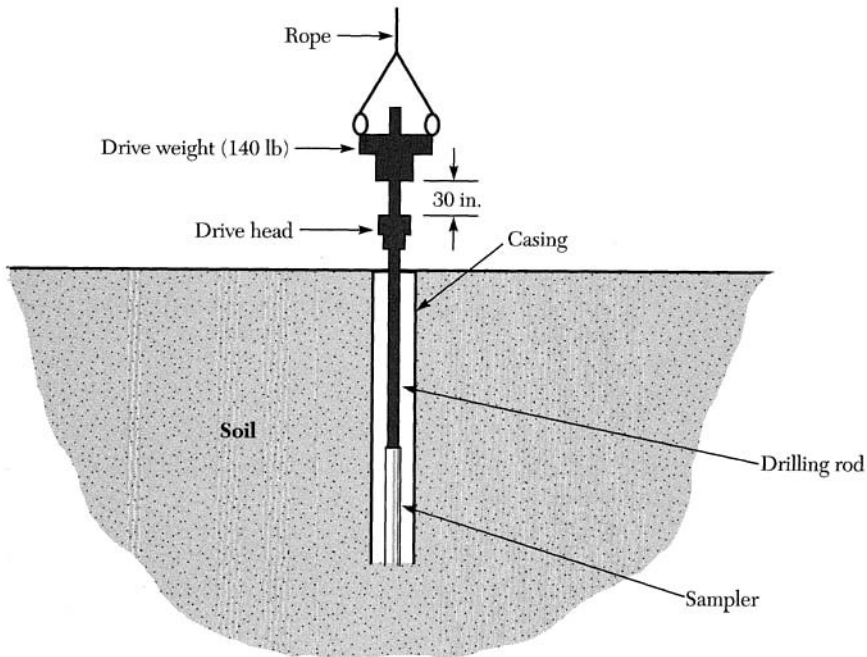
Cross section of a typical boring hole and drilling equipment.
